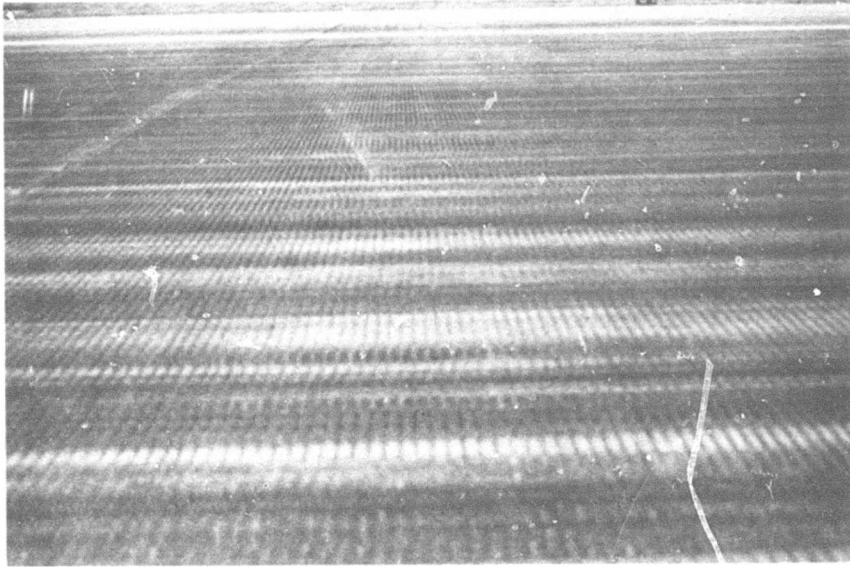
Beale Air Force Base -- General view of grooved runway pavement 3000 feet from north end.
